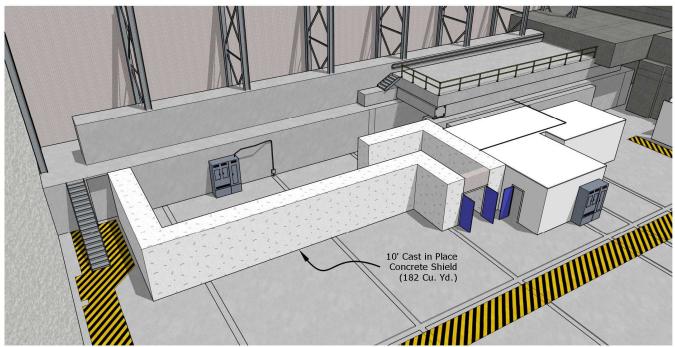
10-Foot Cast-In-Place Injector Cave Expansion
